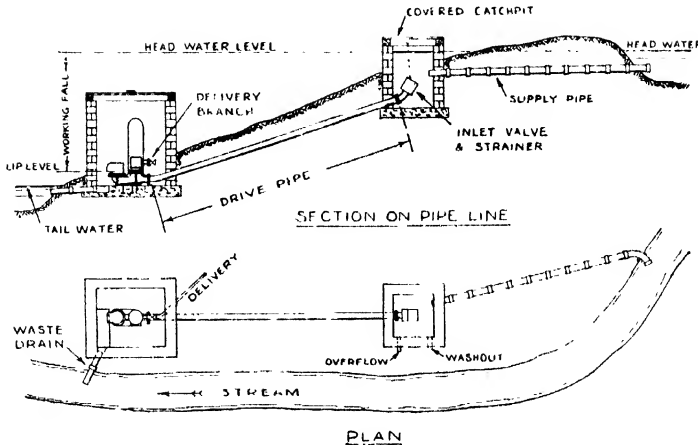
LAYOUT FOR HYDRAULIC RAM
